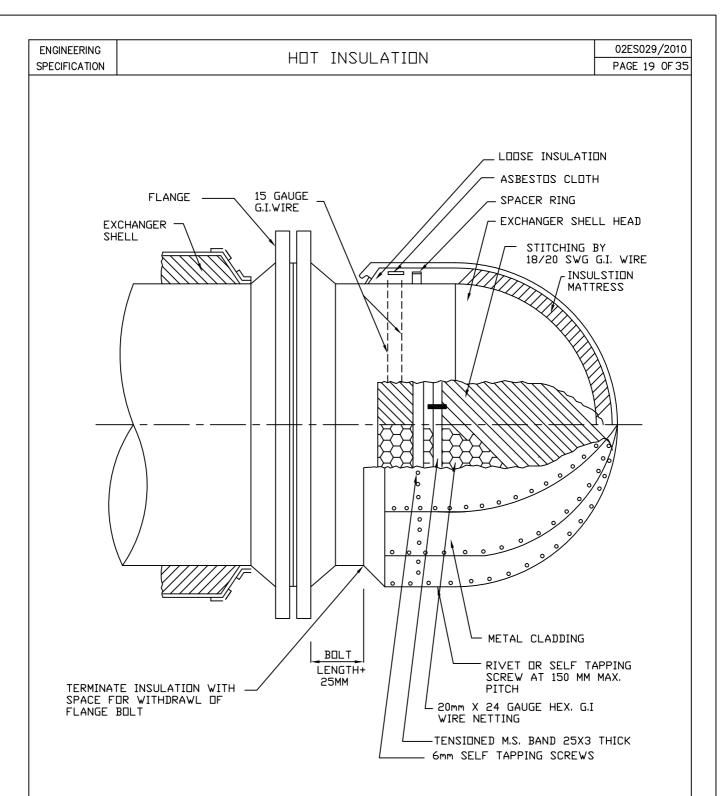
INSULATION OF EXCHANGER SHELL & HEAD
